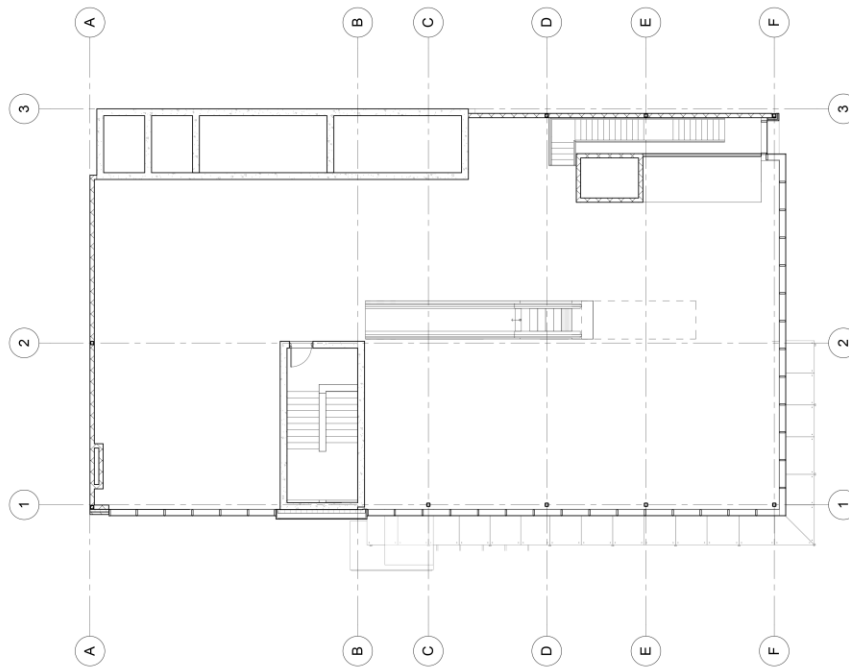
Second floor plan for proposed infill building at 117 Rideau St. (Source: IBI Group, 2016)
